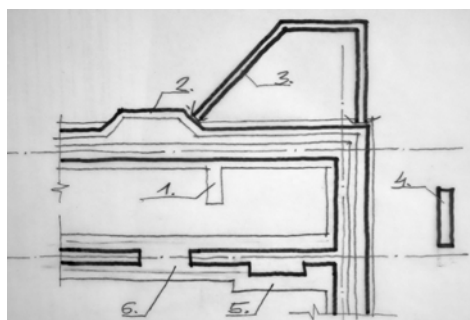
Foundations of a single-family house: 1) foundation for a concrete slab of a staircase; 2) foundation of a bay-window; 3) foundation for a terrace, structurally divided from a house; 4) support for an external staircase; 5) an extension of footing under a pillar; and 6) continuous footing under non-continuous structural wall.
